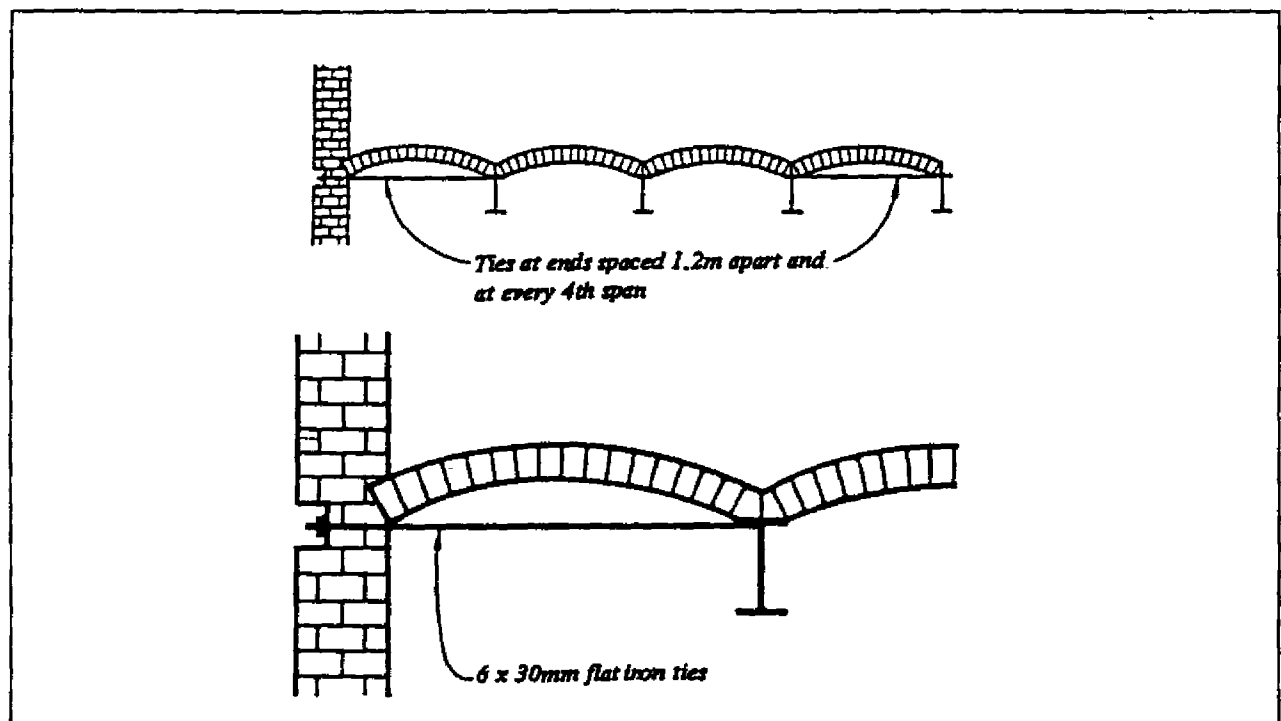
Ties in Jack Arch Floors and Roofs [2].
